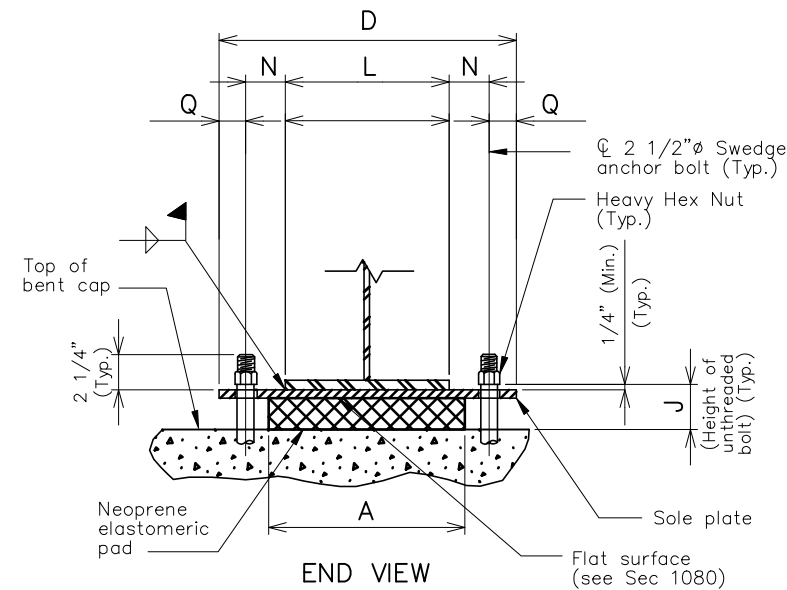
/4" THRU 2 1/2" ANCHOR BOLTS
